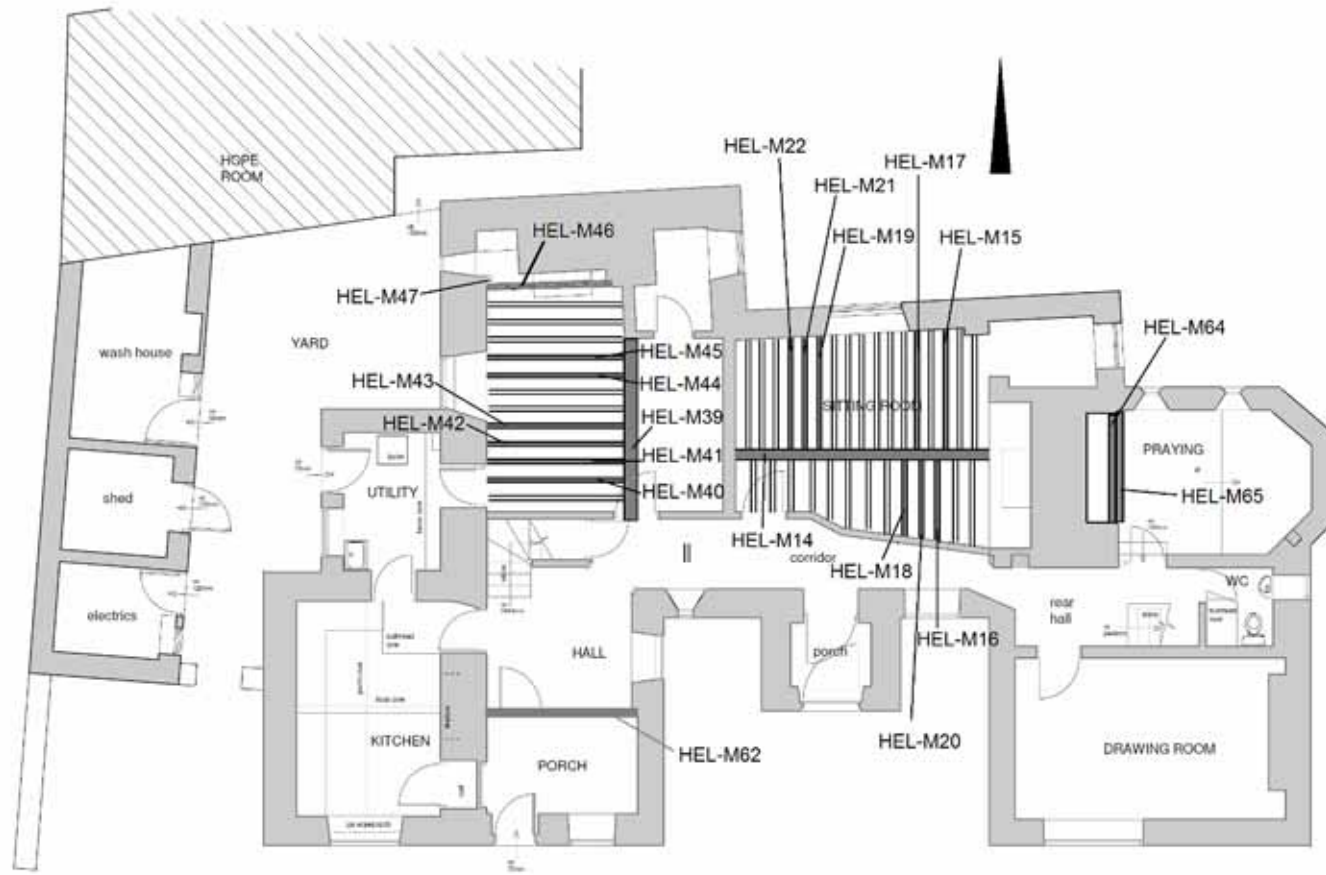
Ground-floor plan, showing the location of samples HEL-M14–22, HEL-M39–47, HEL-M62, and HEL-M64–5 (Malcolm Tempest Ltd)
